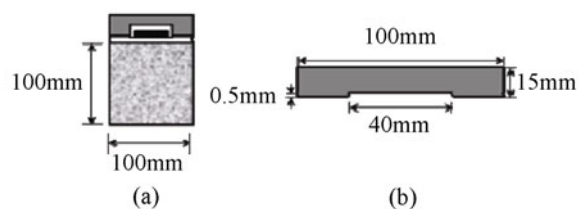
(a) Cross-section of specimen and (b) FRCC plate with detailed dimensions
